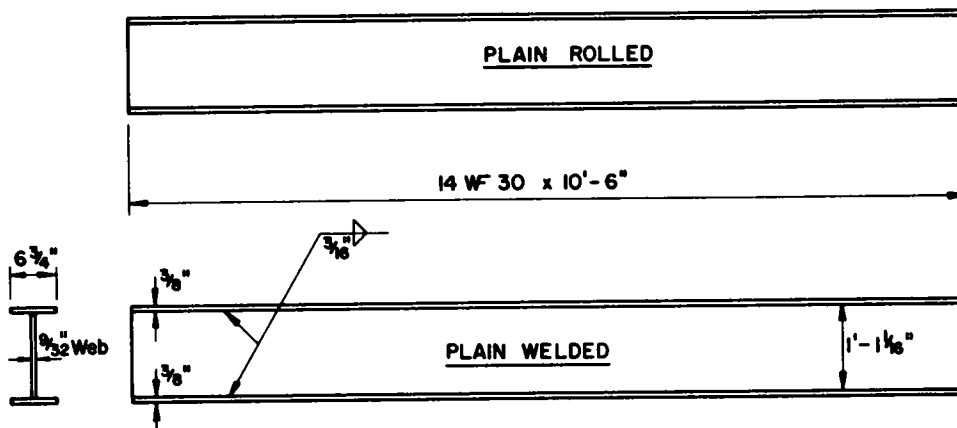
Plain welded and rolled beams used as basic unit.
